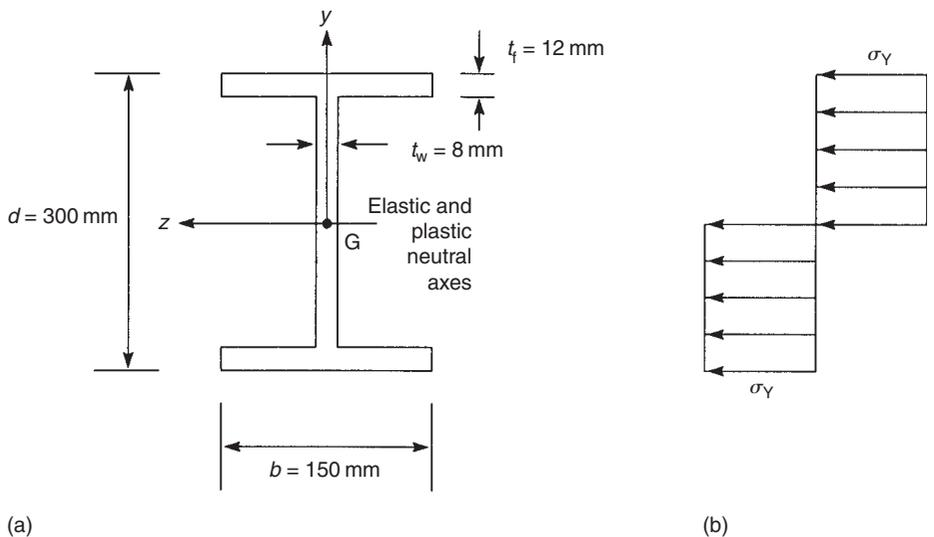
Beam section of Ex. 18.2 (a)
